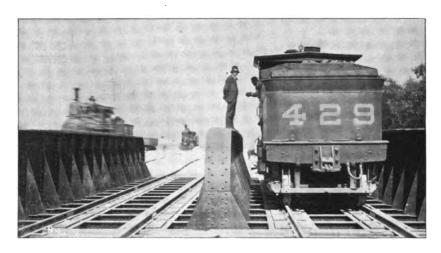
SHOWING CLEARANCE AT BRIDGES WITH TRACKS 13 FEET CENTER TO CENTER. Top of highest Girder, 5 feet above top of rail, or 1½ feet below car window. Girder 16 inches wide. Clearance 10 inches.
